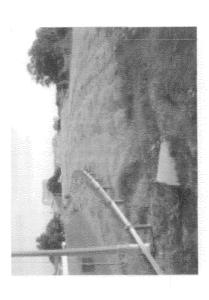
Option 1. View of the proposed route alongside Lourensrivier Road
